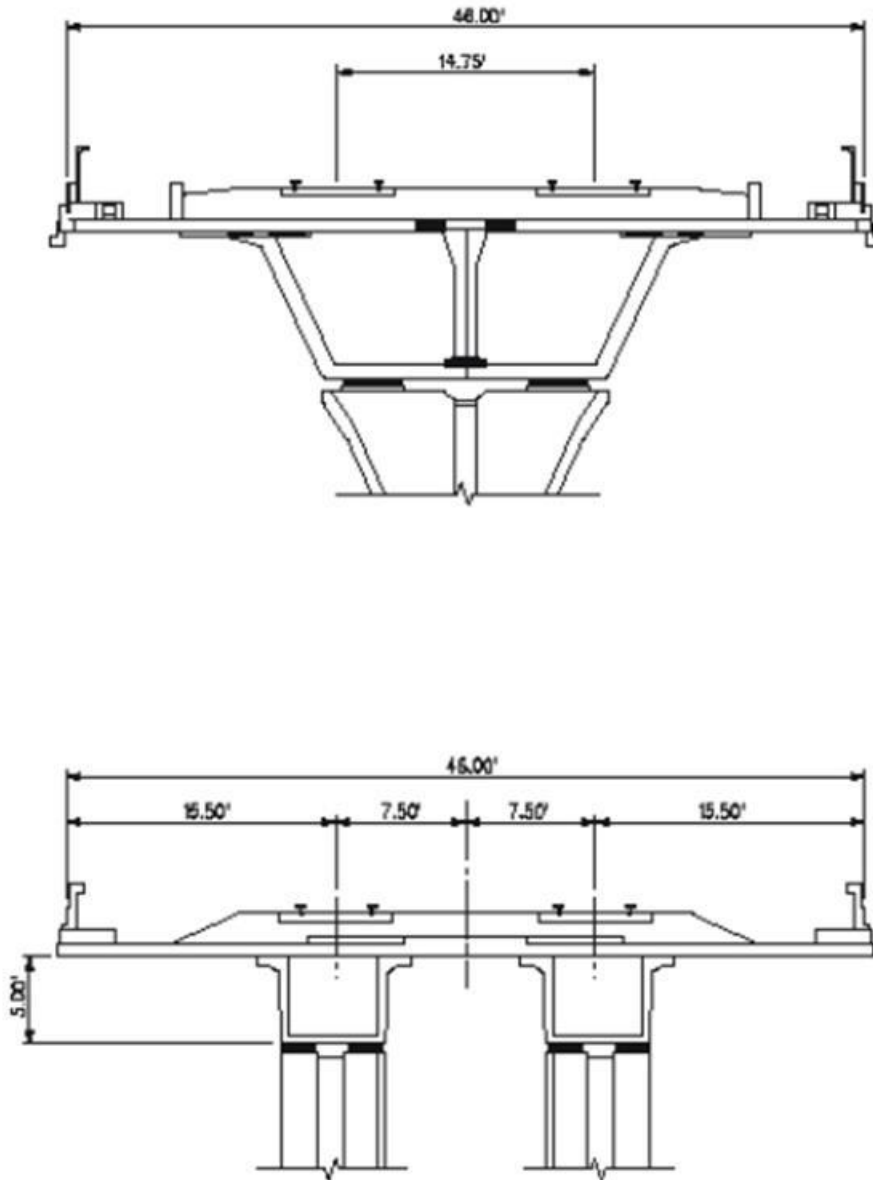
AVE Box Girder and Double Beam Cross Section
